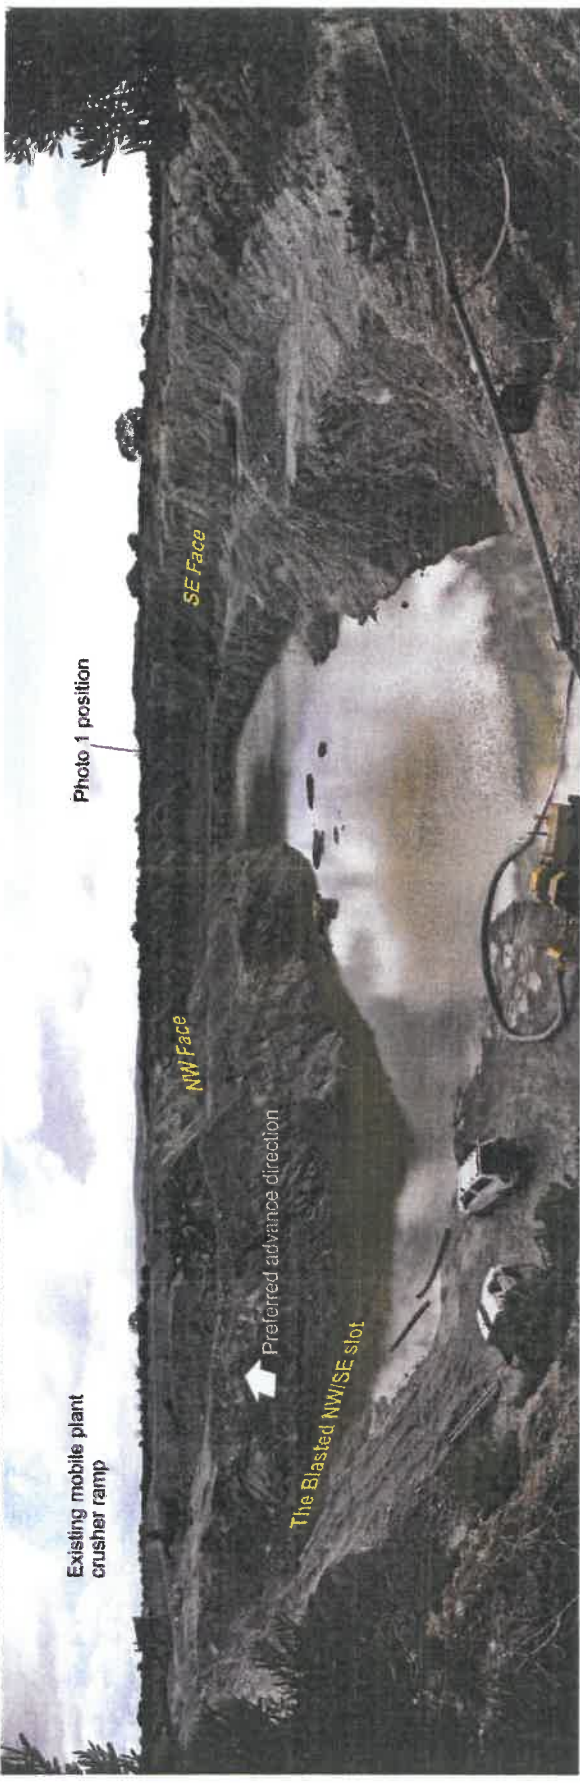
Looking north over the excavation showing the NW/SE slot blasted to achieve optimal advance direction (from safety point of view)
